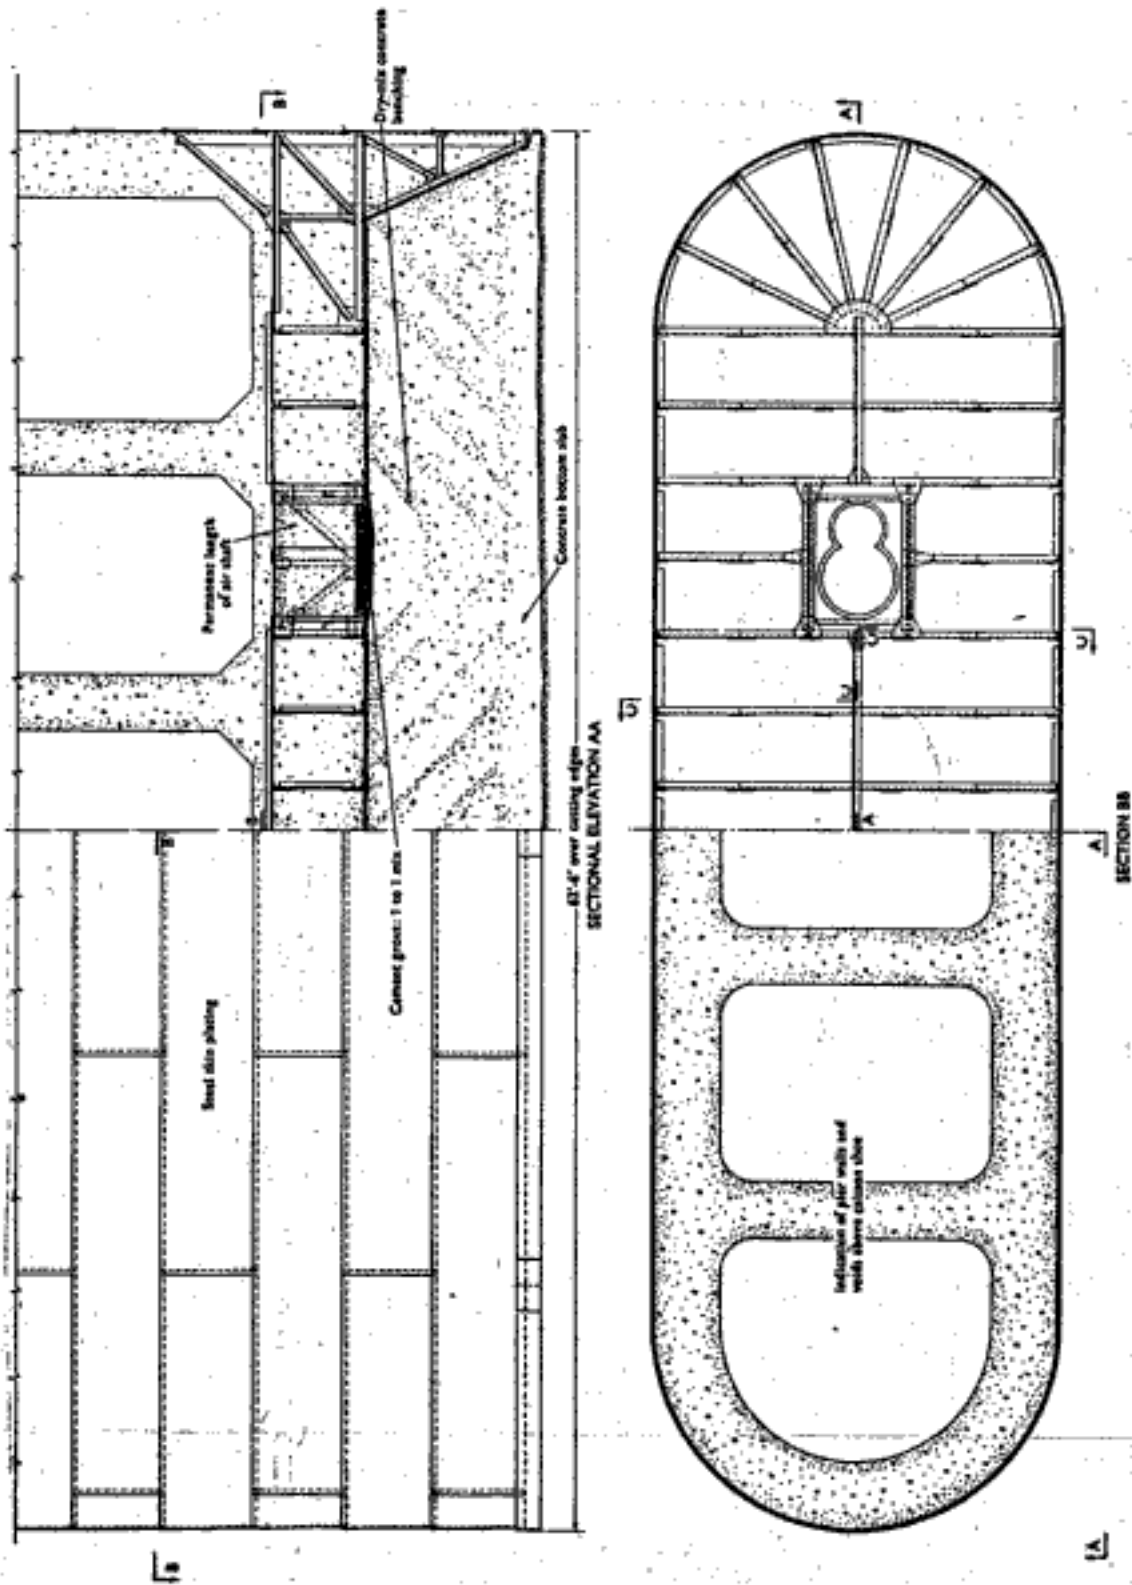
Typical steel caisson for river pier showing deposition of concrete in working chamber (Wilson and Sully³²)
